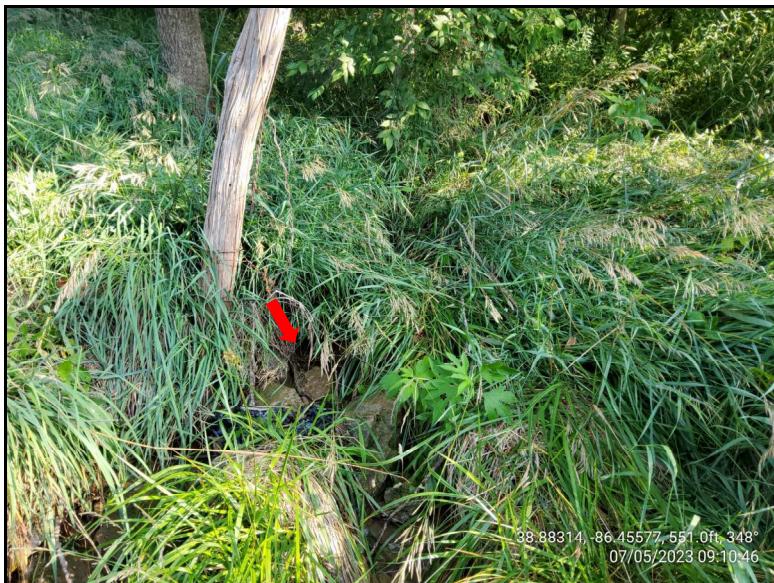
Taken from SR 58, facing north (upstream) showing the CMP inlet and UNT to Leatherwood Creek (red arrow).
